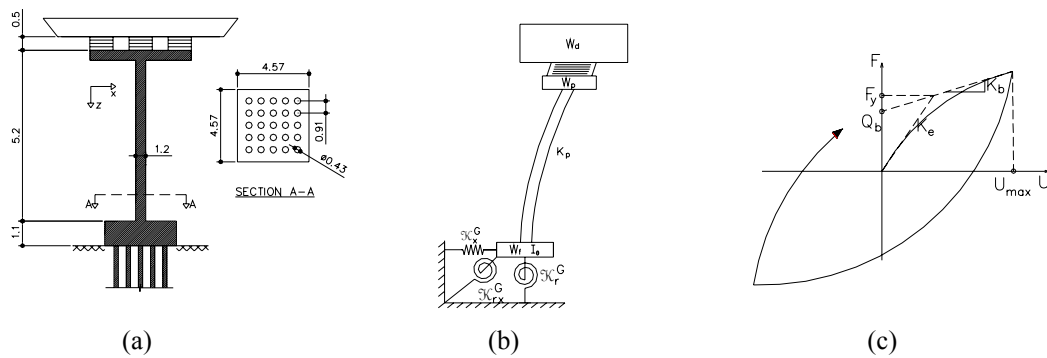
(a) Bridge and pile foundation system; (b) Mechanical model for the bridge and foundation system utilized in this study; (c) Bilinear force displacement relation of the seismic isolation system.
